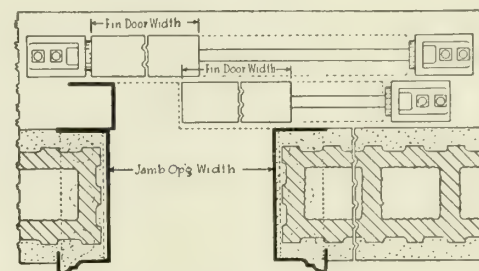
SPECIAL MOULDED STEEL BUCK FOR TWO-SPEED ELEVATOR DOORS
